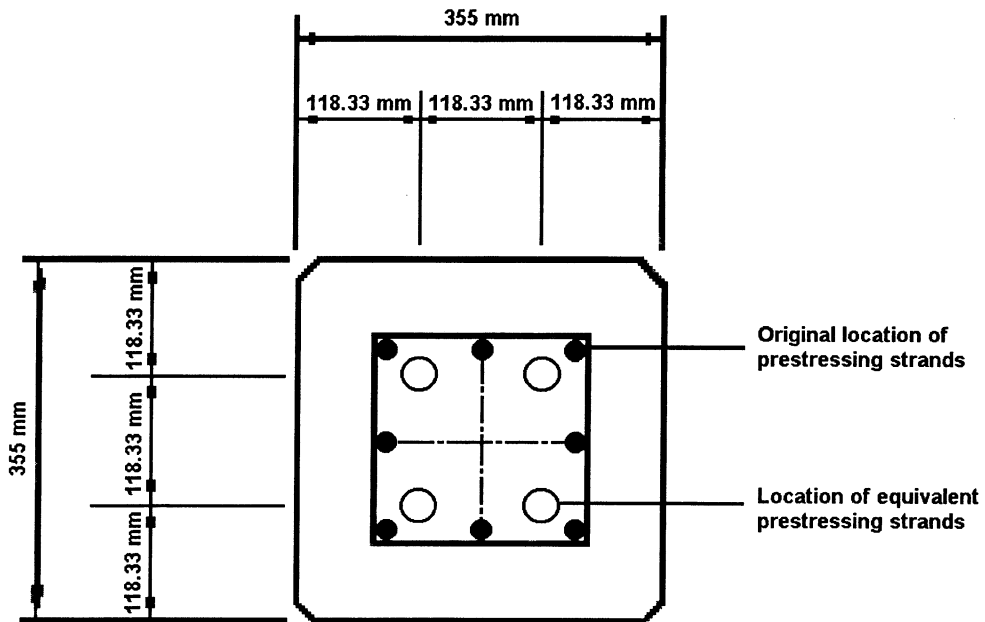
Equivalent Prestressing Strands Location on Concrete Pile and on Finite Element Model
